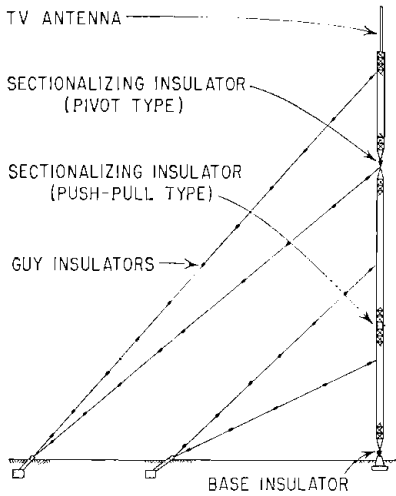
Example of a sectionalized tower shown with two types of sectionalizing insulators.
